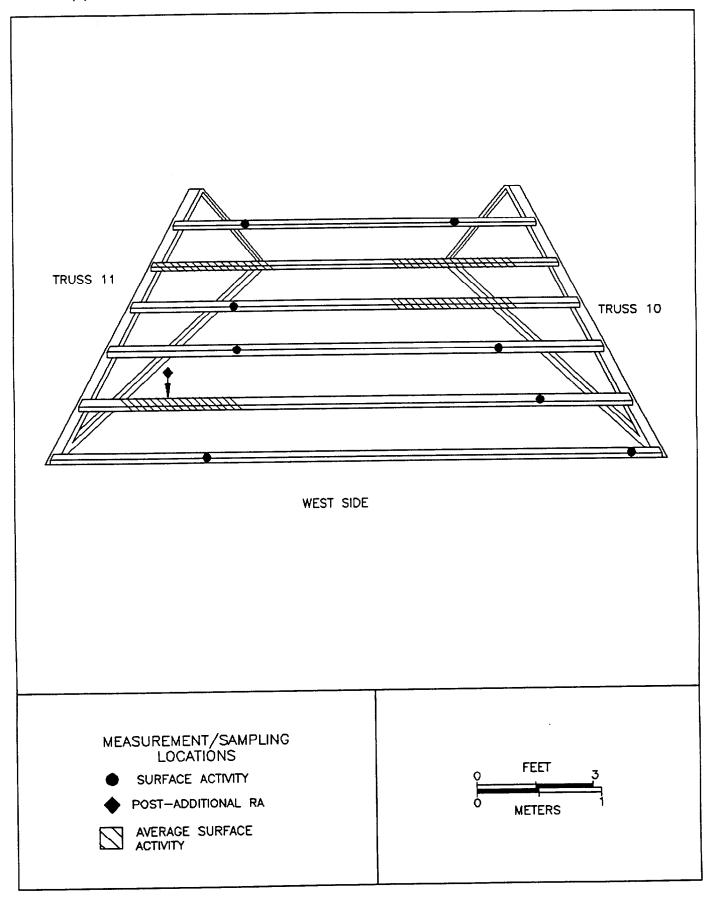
Building 3, Bay 10, West — Measurement and Sampling Locations
